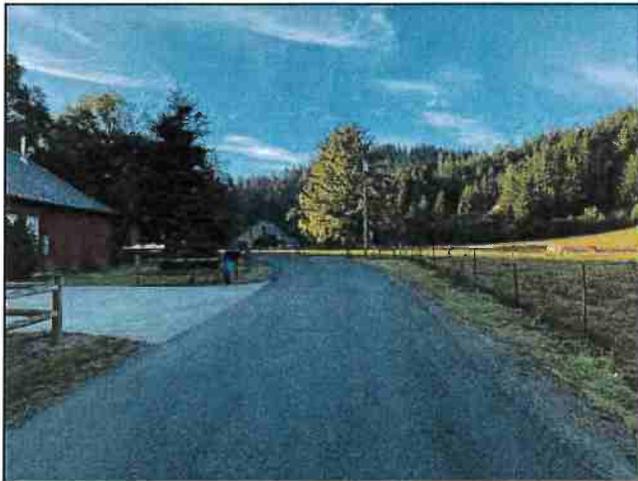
Williams Creek Rd Looking SE @ First Driveway South of Grizzly Bluff Rd
